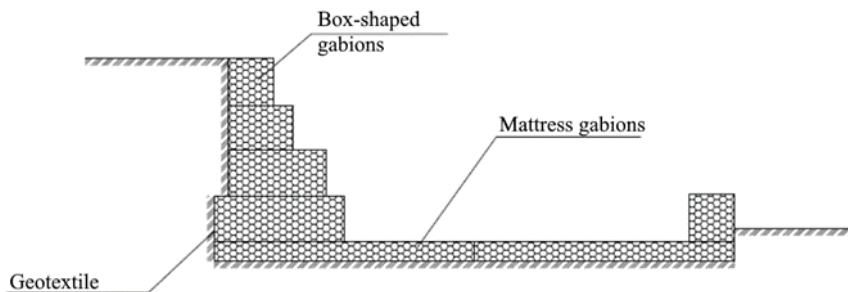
Reconstruction of destroyed retaining walls with gabion walls.
